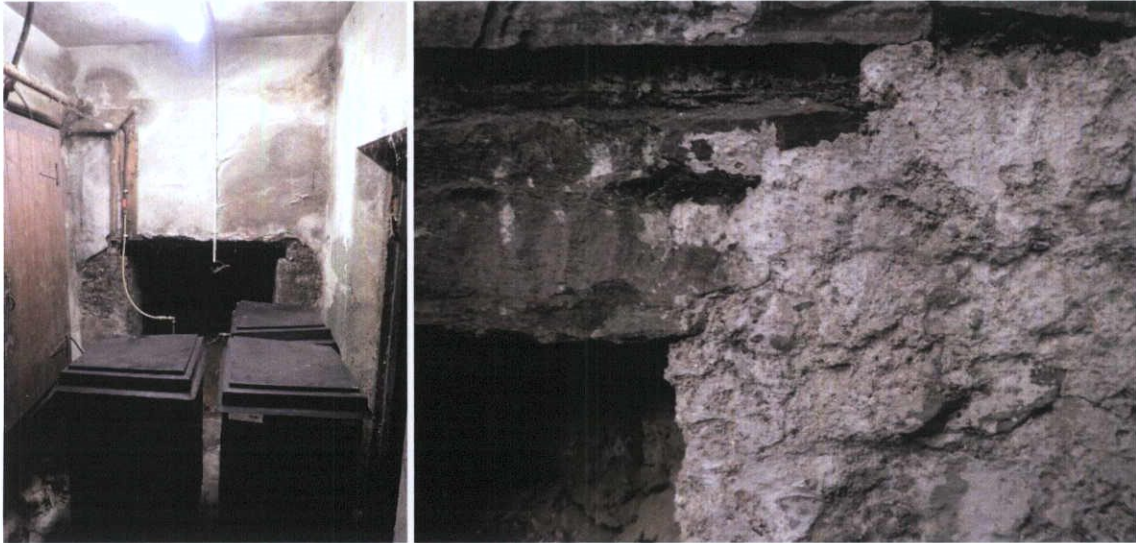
Calp limestone masonry at basement level at the front of No.57 O'Connell Street.
